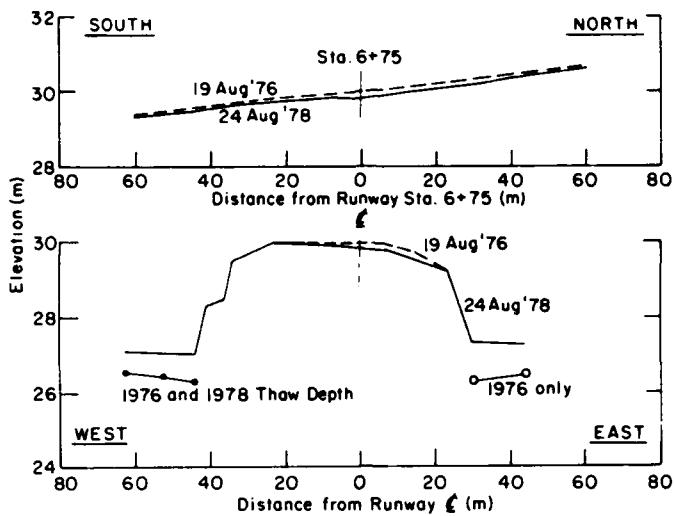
Surface elevations, south site, Dietrich Airfield. The upper graph shows the centerline profile; the lower graph shows the elevations on the cross section, station 6+75.
